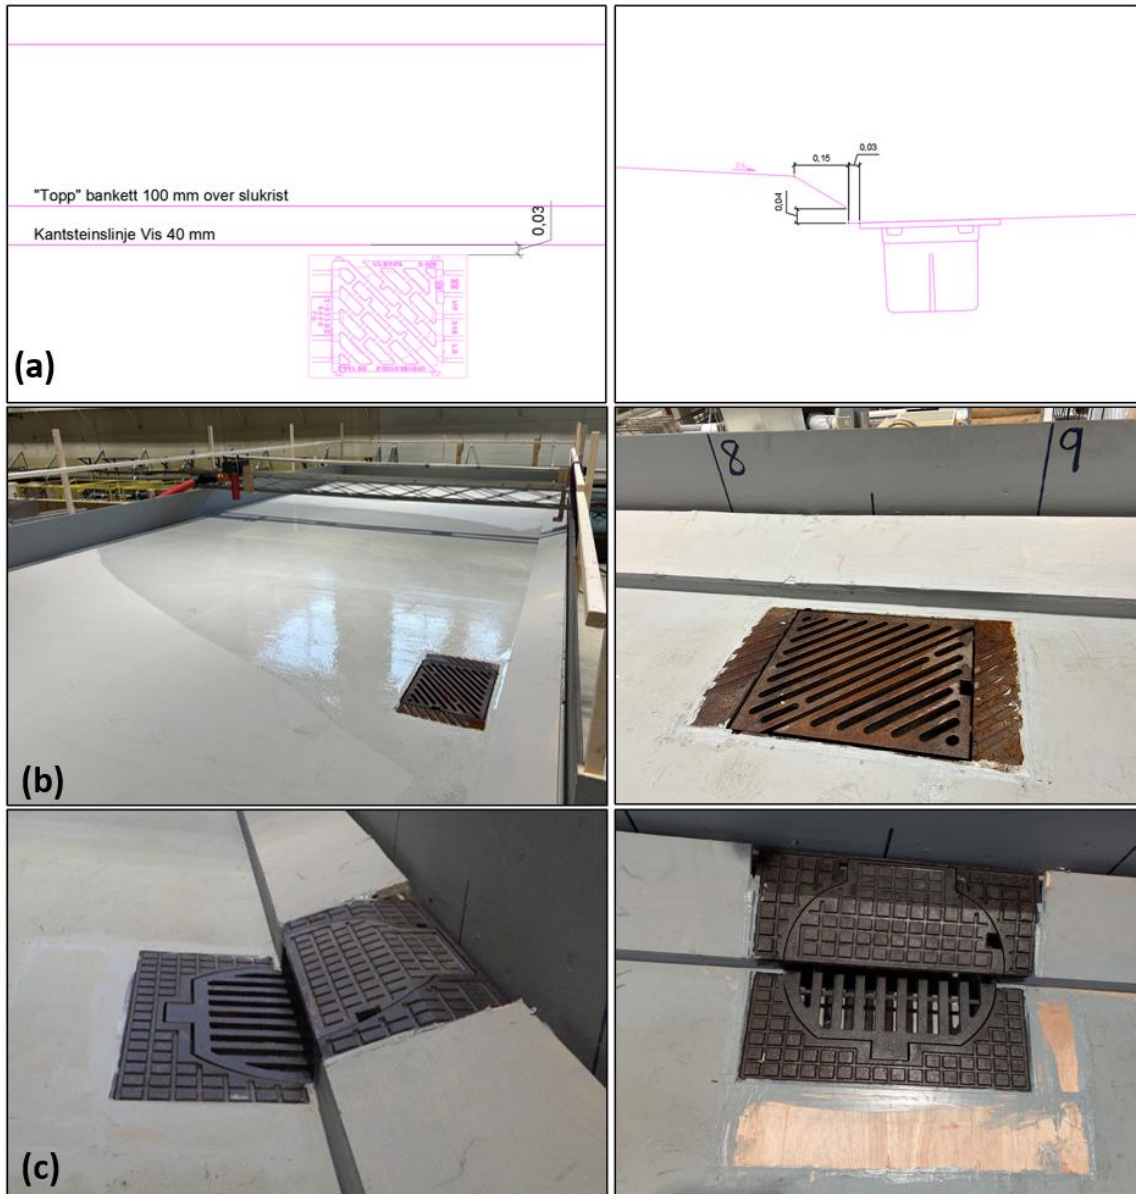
a) Rennestensluk installation specifications, b) Rennestensluk as installed on the test setup, and c) the Kjeftsluk after installation
